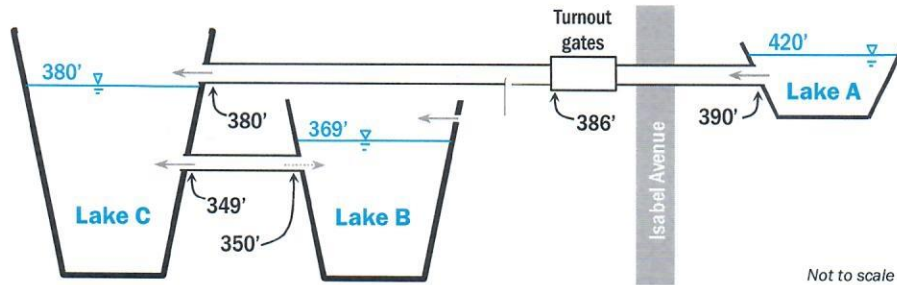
Schematic representation of proposed lake conduits and approximate elevations
